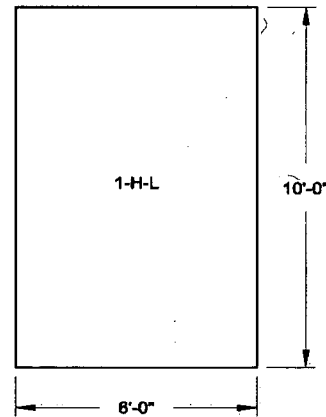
H.6-159: ROOF 6 LOOKING DOWN
